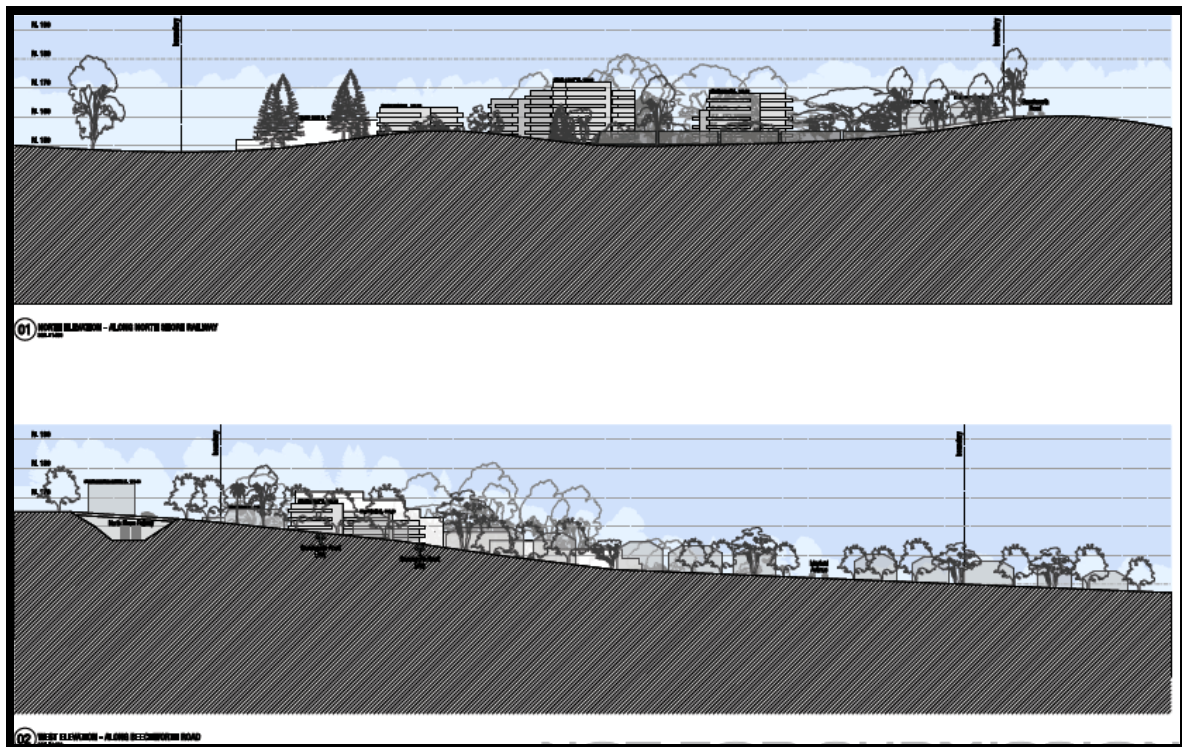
Indicative Elevations – North & West. (Source: Ancher Mortlock Woolley, 2009)
